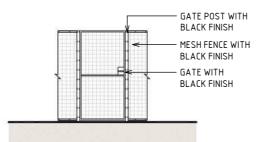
DETAIL - RAIL TUNNEL SERVICES FENCING - HIGH SECURITY VEHICLE ACCESS FENCING GATE SCALE: 1:100
